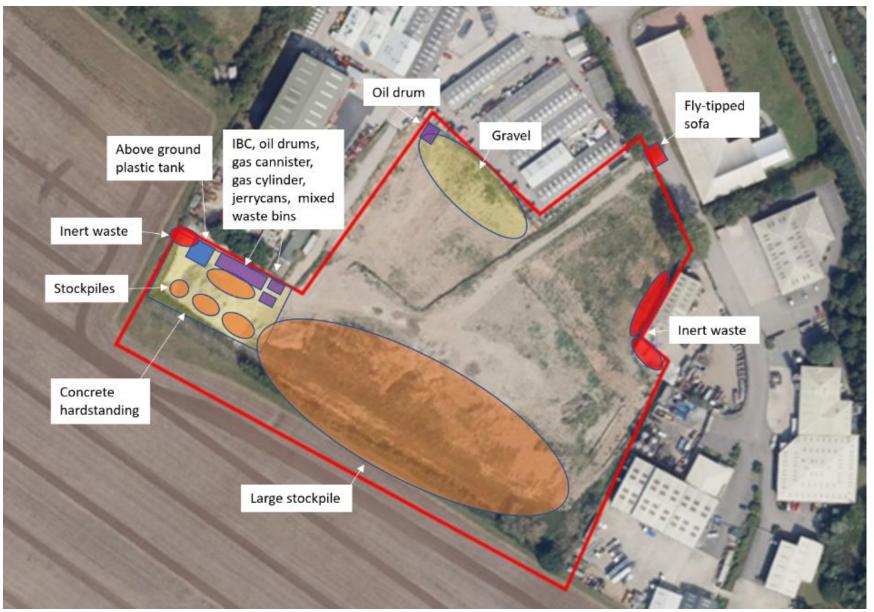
Site Feature Plan Land off Cotswold Dene, Standlake
